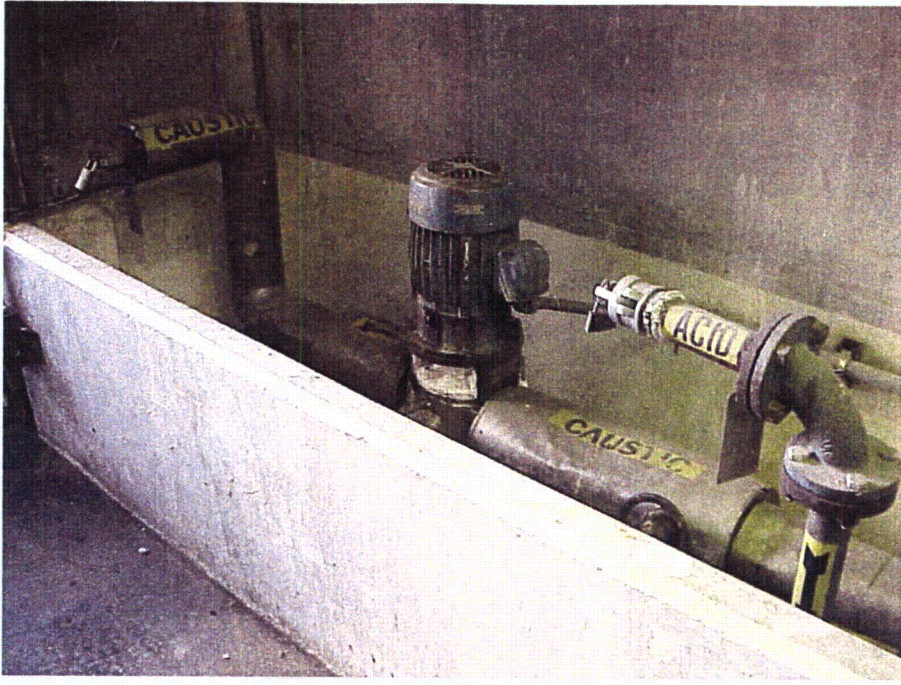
Acid and Caustic Pump and Truck Connection Containment.
